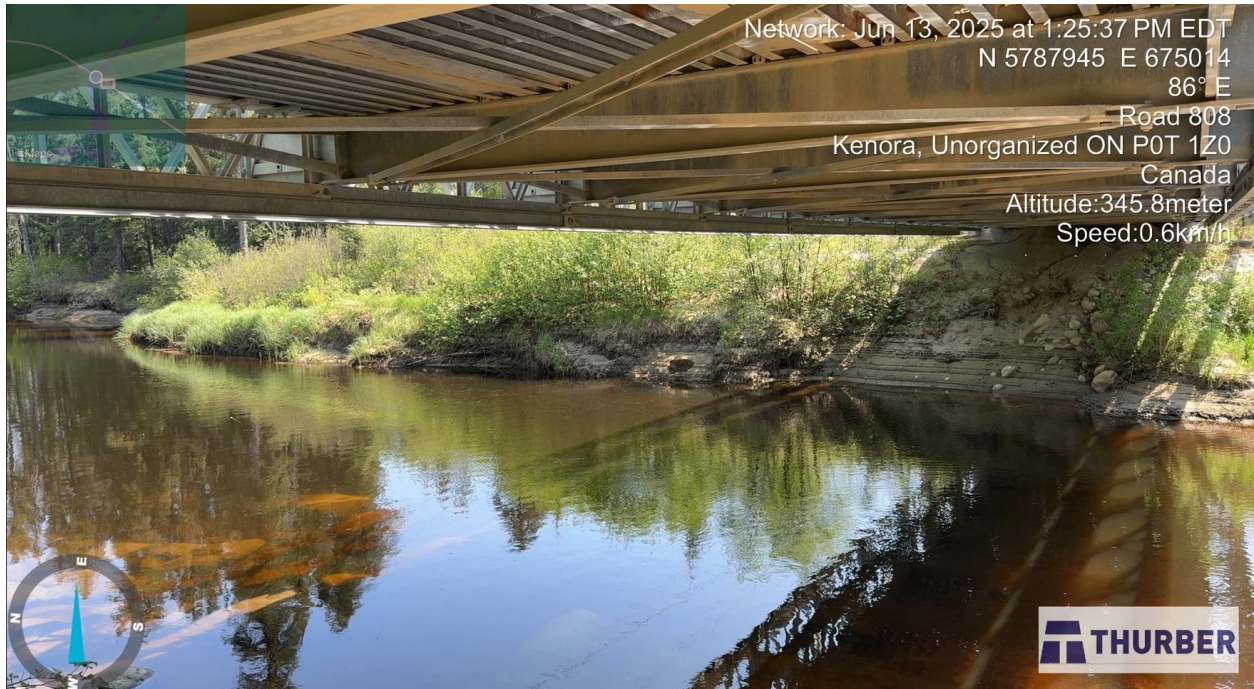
Looking at the river, below the bridge (June 13, 2025).
